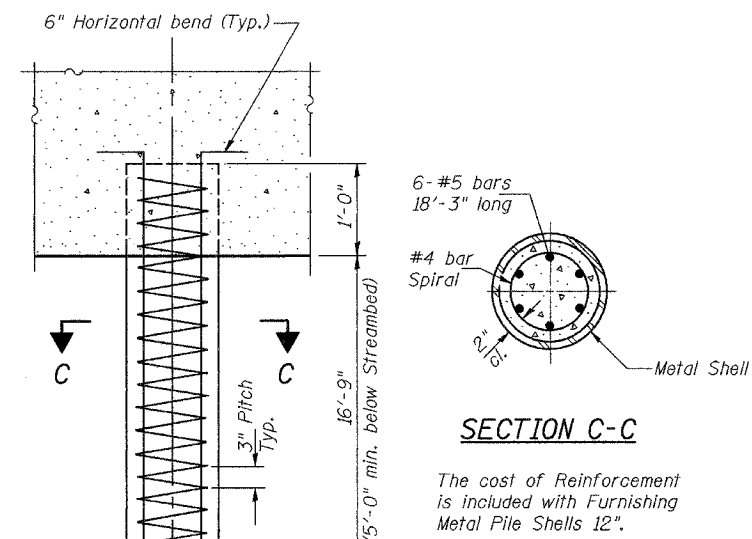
DETAIL OF CYLINDRICAL STEEL SHELL FOR CAST IN PLACE CONCRETE PILES
